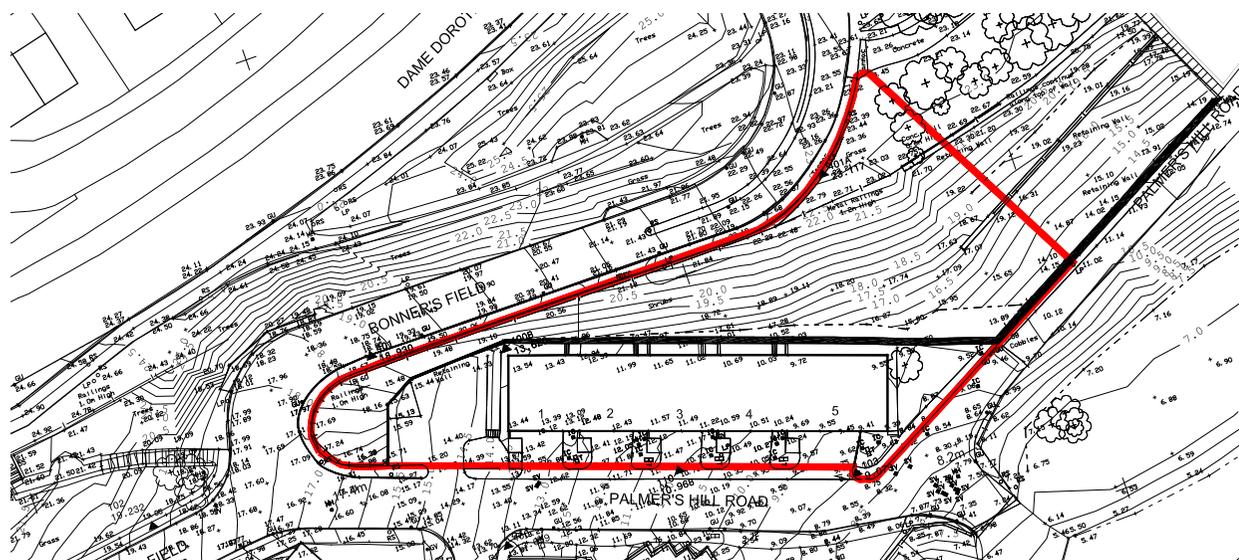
Topography Plan, showing the steep slope by way of 0.5m contours and access from Dame Dorothy Street
